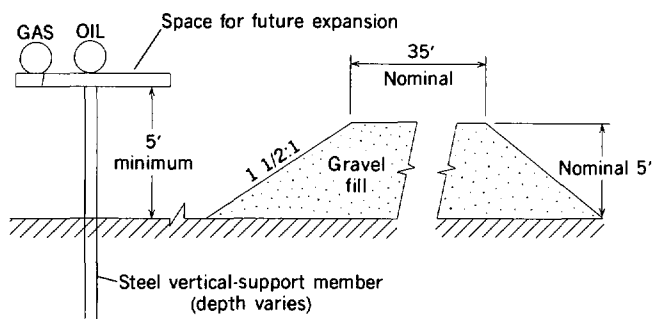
Typical cross section of pipeline and road development. No scale.
